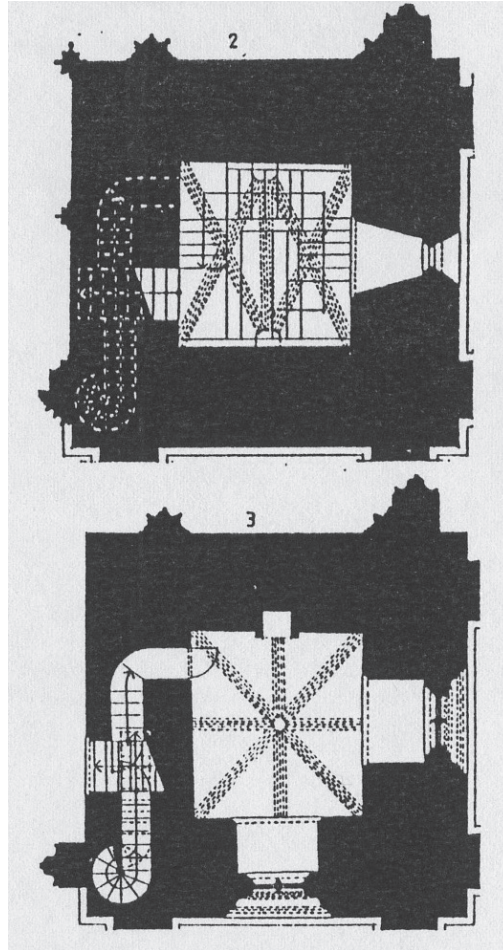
St Elizabeth's, Košice, south tower, ground plans of ground floor (above, 2) and first floor (below, 3). A broad staircase in the ground-floor space (above, 2) approaches a passage in the tower's north wall that leads through to the church's western organ gallery (*i.e.* to the left of the tower; see also Fig. 1, where the gallery is shown). From within this wall passage, two further passages within the thickness of the wall lead to the upper parts of the tower, one to the first-floor space and one to the stories above (from Martina Schmiedlová, "Točité schodisko južnej veže Dómu sv. Alžbety v Košiciach", in *Dějiny věd a techniky*, 29, 1996, p. 11)
